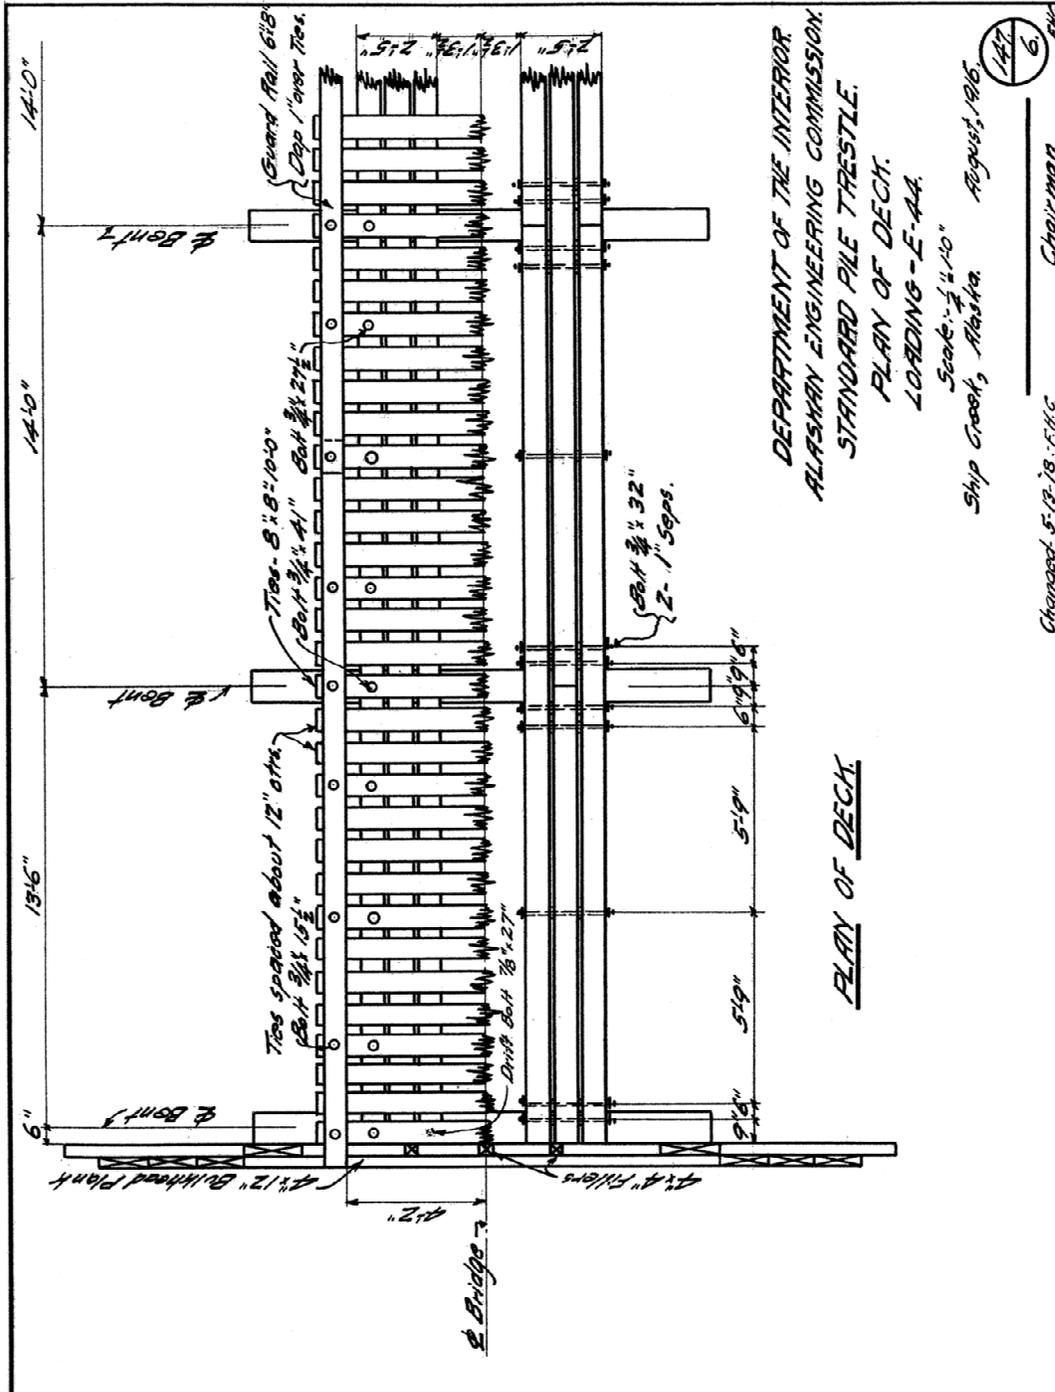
Standard Pile Trestle, Plan of Deck, Loading E-44, August 1916, Sheet 147.6.
